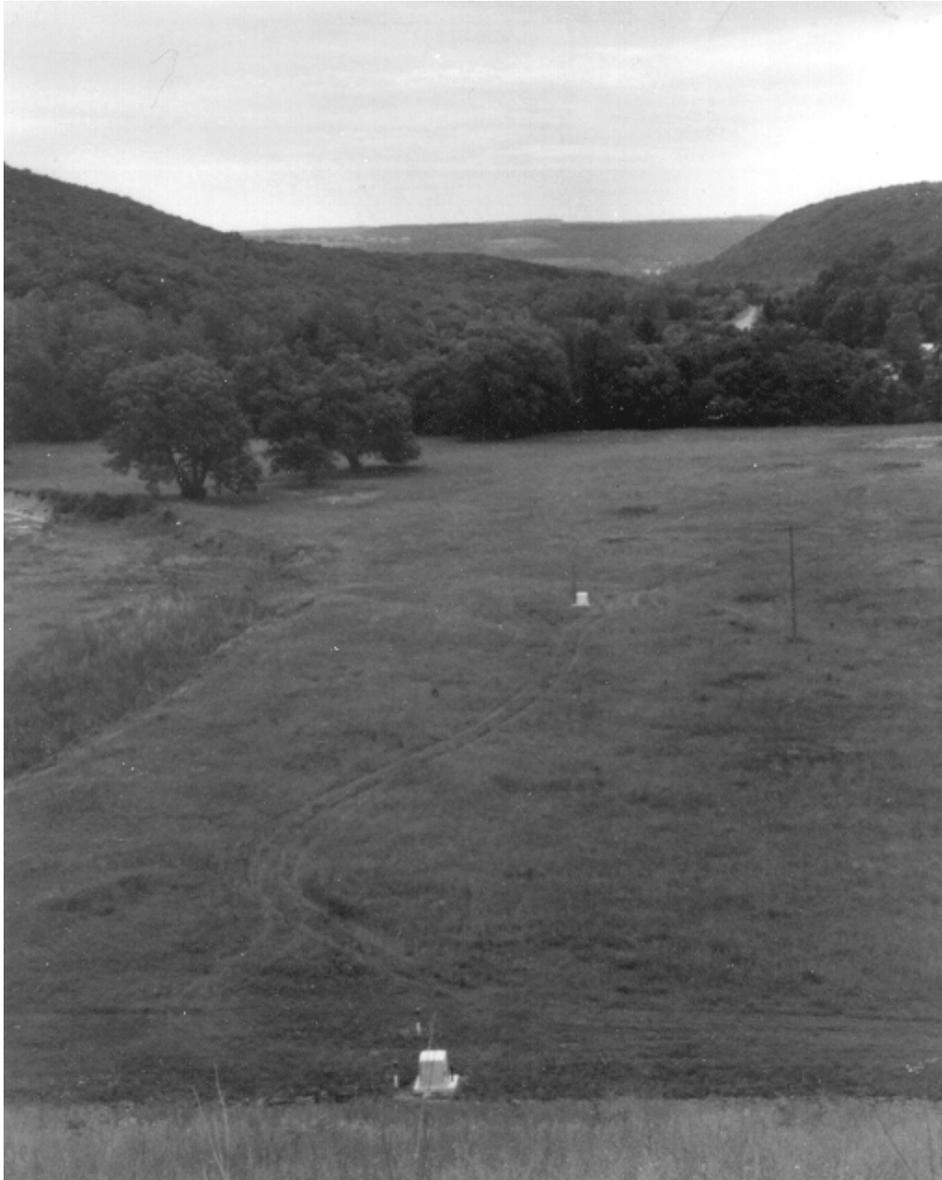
Typical strong-motion instrument installations (Almond Dam, NY, toe and free field stations)
